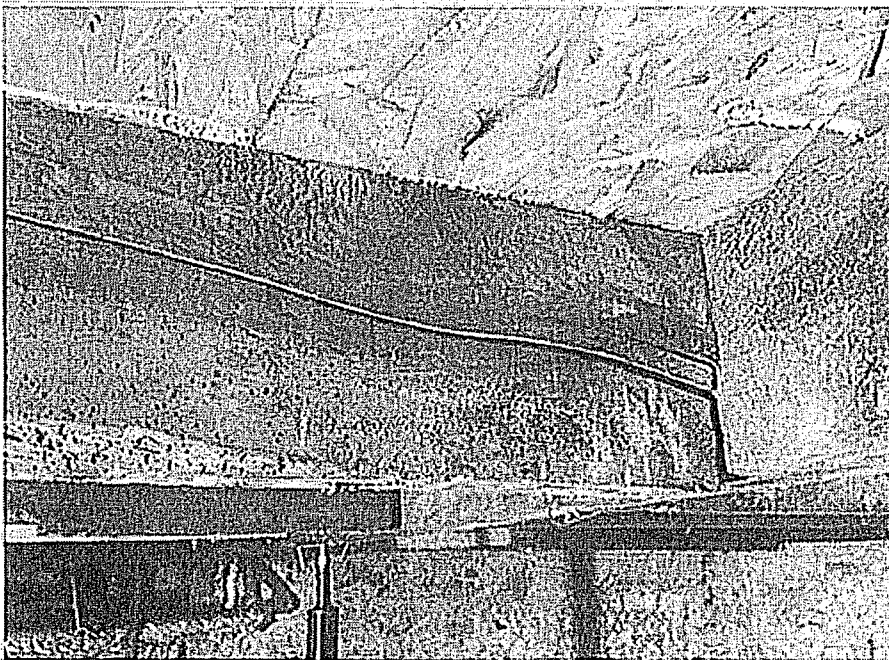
Joist with apparent insect deterioration and shear failure.
